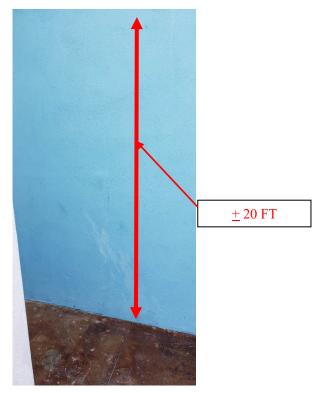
Location 6: Approximately 20 ft long new 12x8 concrete column. See detail 6/S104.
